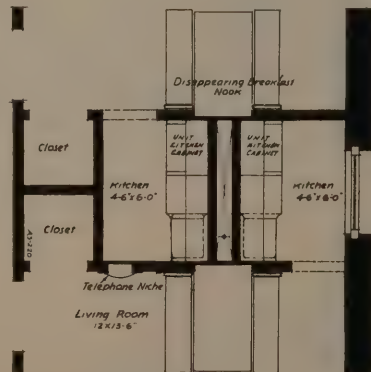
A tiny kitchenette in a room of its own, adjoining the apartment living room, where a Disappearing Breakfast Nook is installed.
